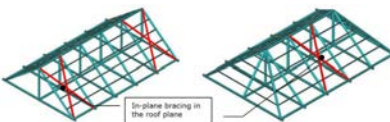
4. In-plane bracing in the plane of the roof incline. Note: If such bracing is used one brace will be continuous the other will be made of two half length braces.
